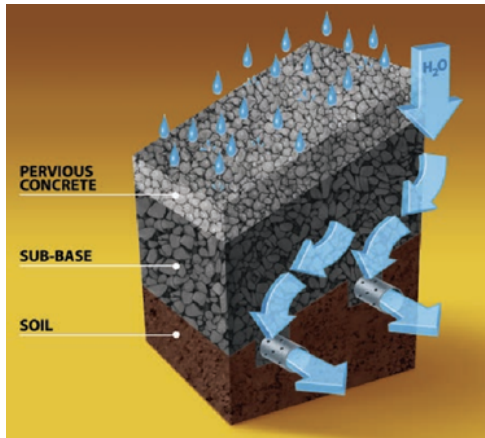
Pervious Concrete Pavement Structure (Image Courtesy of Quick Mix Website) and Sika USA
